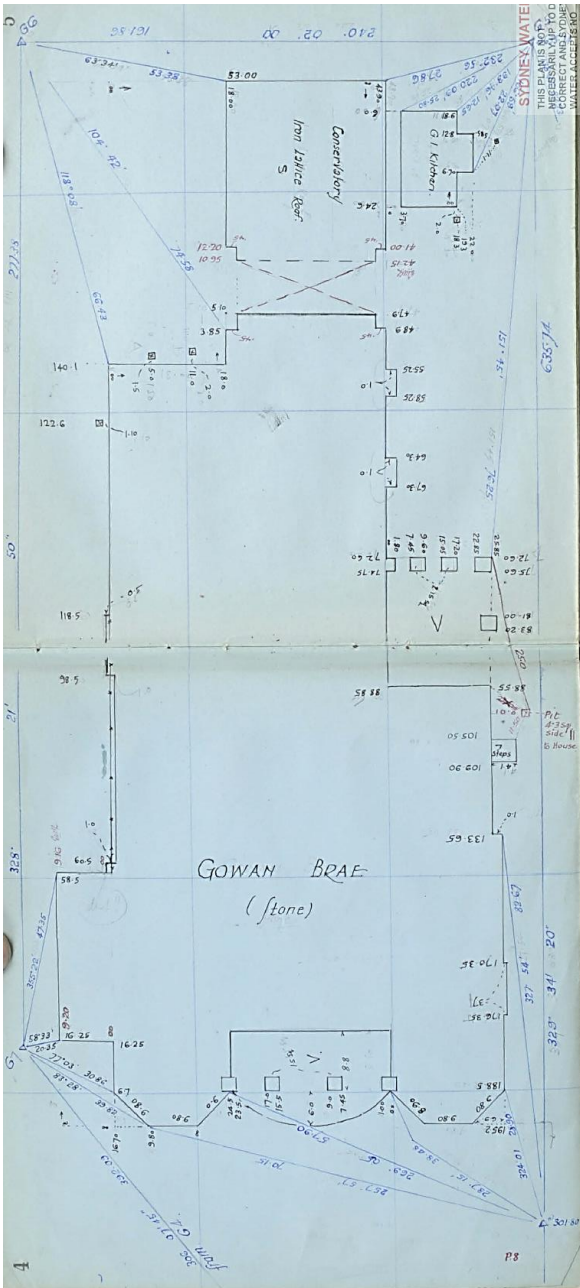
1942 detail sheet indicating footprint of Gowan Brae House
